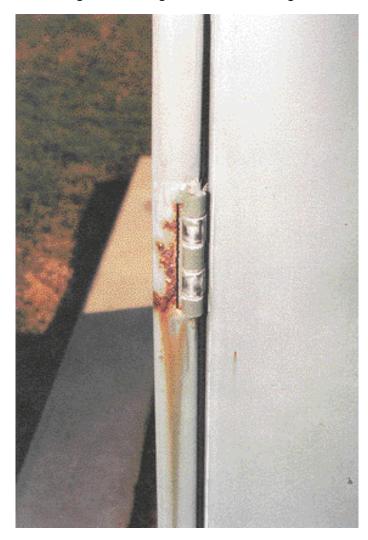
Light Corrosion at Weld Seam (No Serious Pitting)
